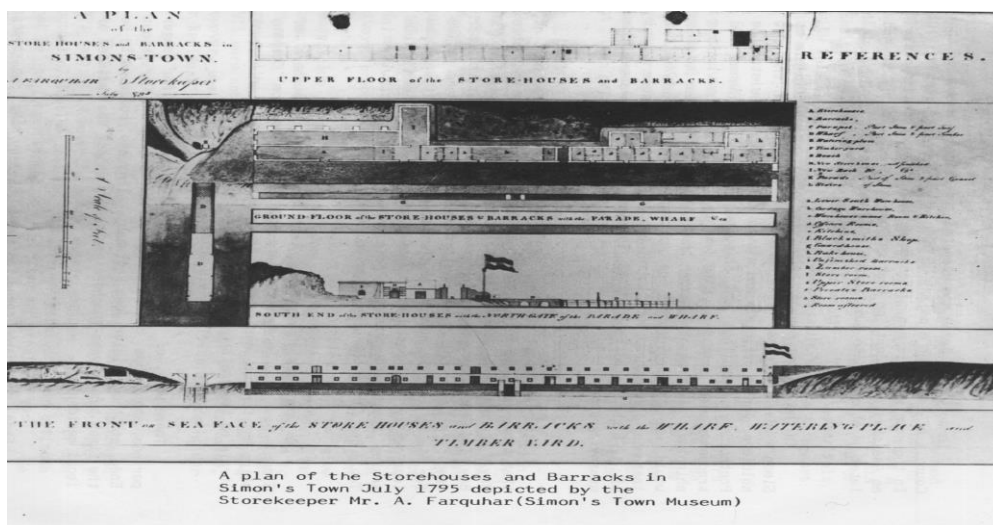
A plan of the storehouses and barracks in Simon's Town July 1795
